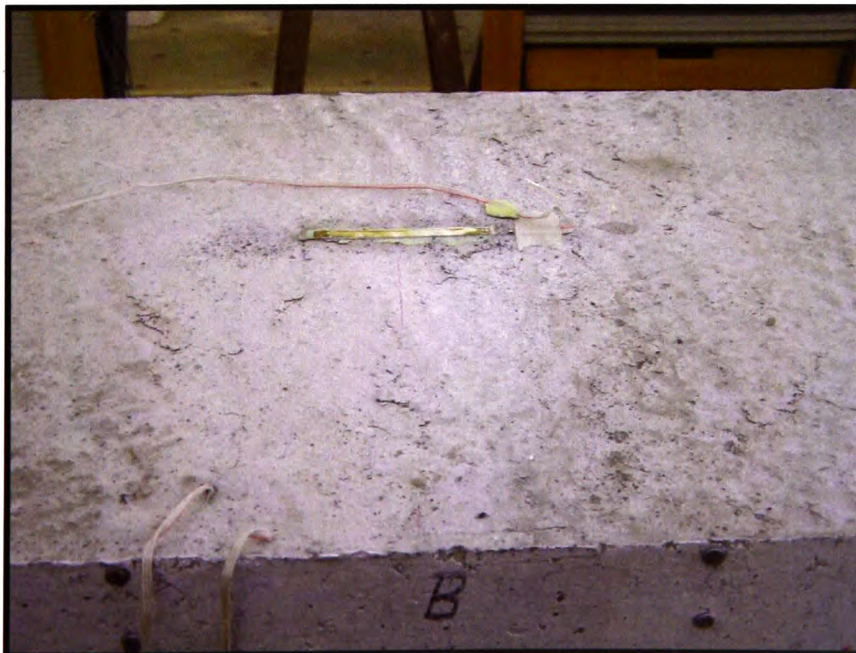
View of compressive concrete failure of 12SCF4 slab
